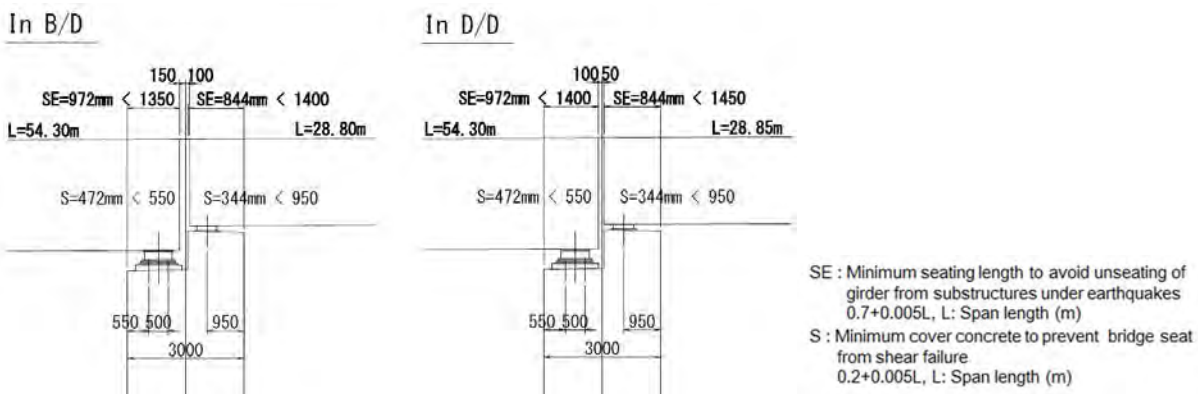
Configuration of T-type Pier (End Pier) in the B/D
